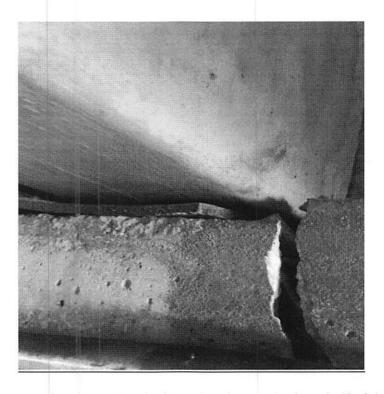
Loose bearing pad. Joist is not bearing on the front half of the cracked haunch.
